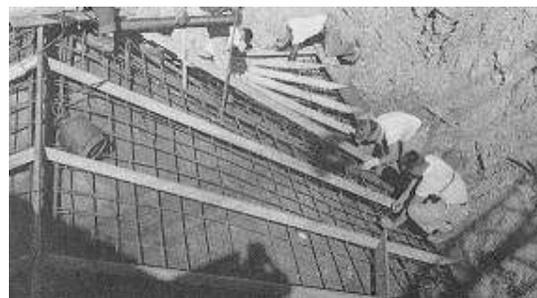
Rectangular Hyperbolic Paraboloid Shell Foundation
